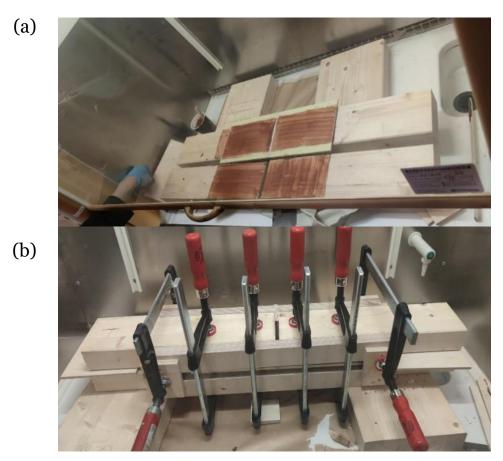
(a) specimen gluing, (b) clamping the specimen.
